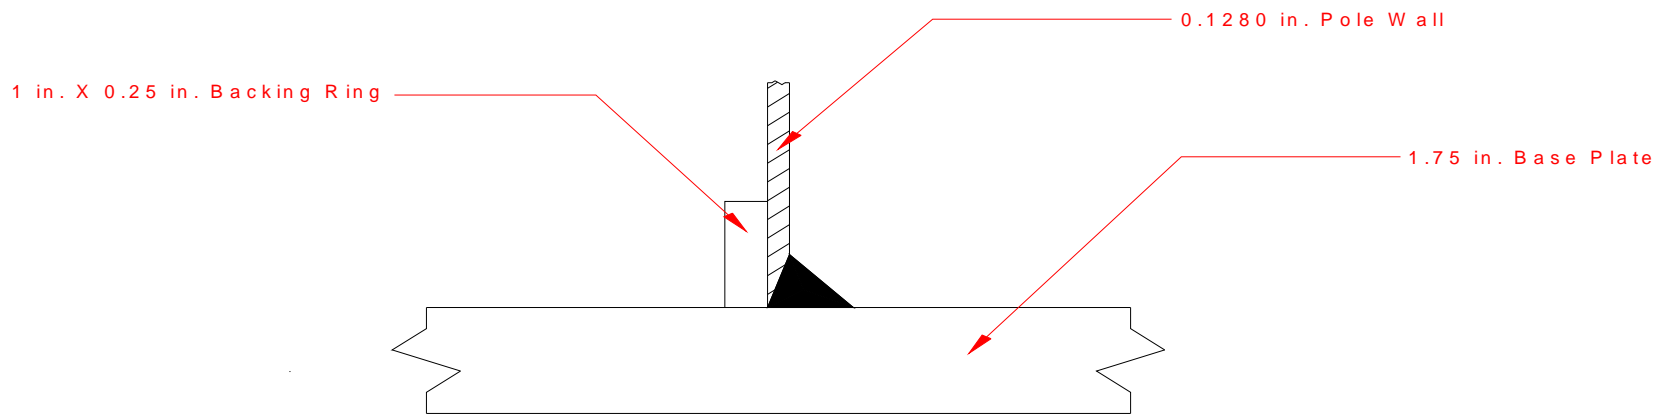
Detail of CJP welded pole-to-base plate connection
